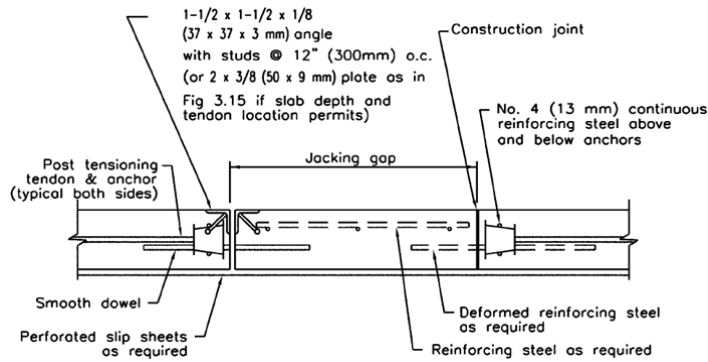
joint detail according to ACI committee 302 (edge strengthening made by steel angular)
